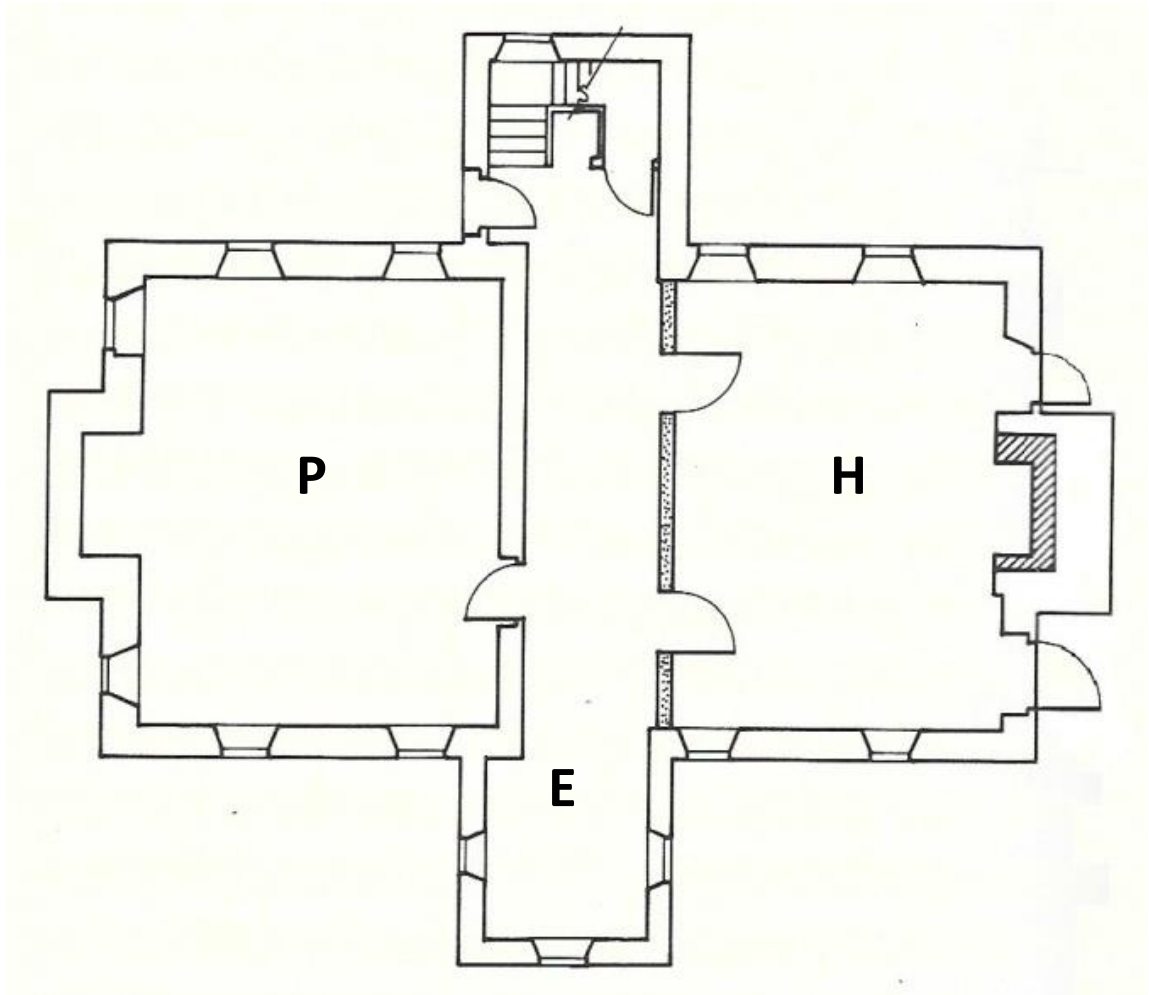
Ground-floor plan of Bacon's Castle, Surry County, built 1665. Bacon's Castle originally had a hall-parlor plan, an entry tower, and a stair tower. The shaded wall was added in the eighteenth century to make an unheated passage. From Upton, "Vernacular Domestic Architecture," 322. Room labels added by author.
